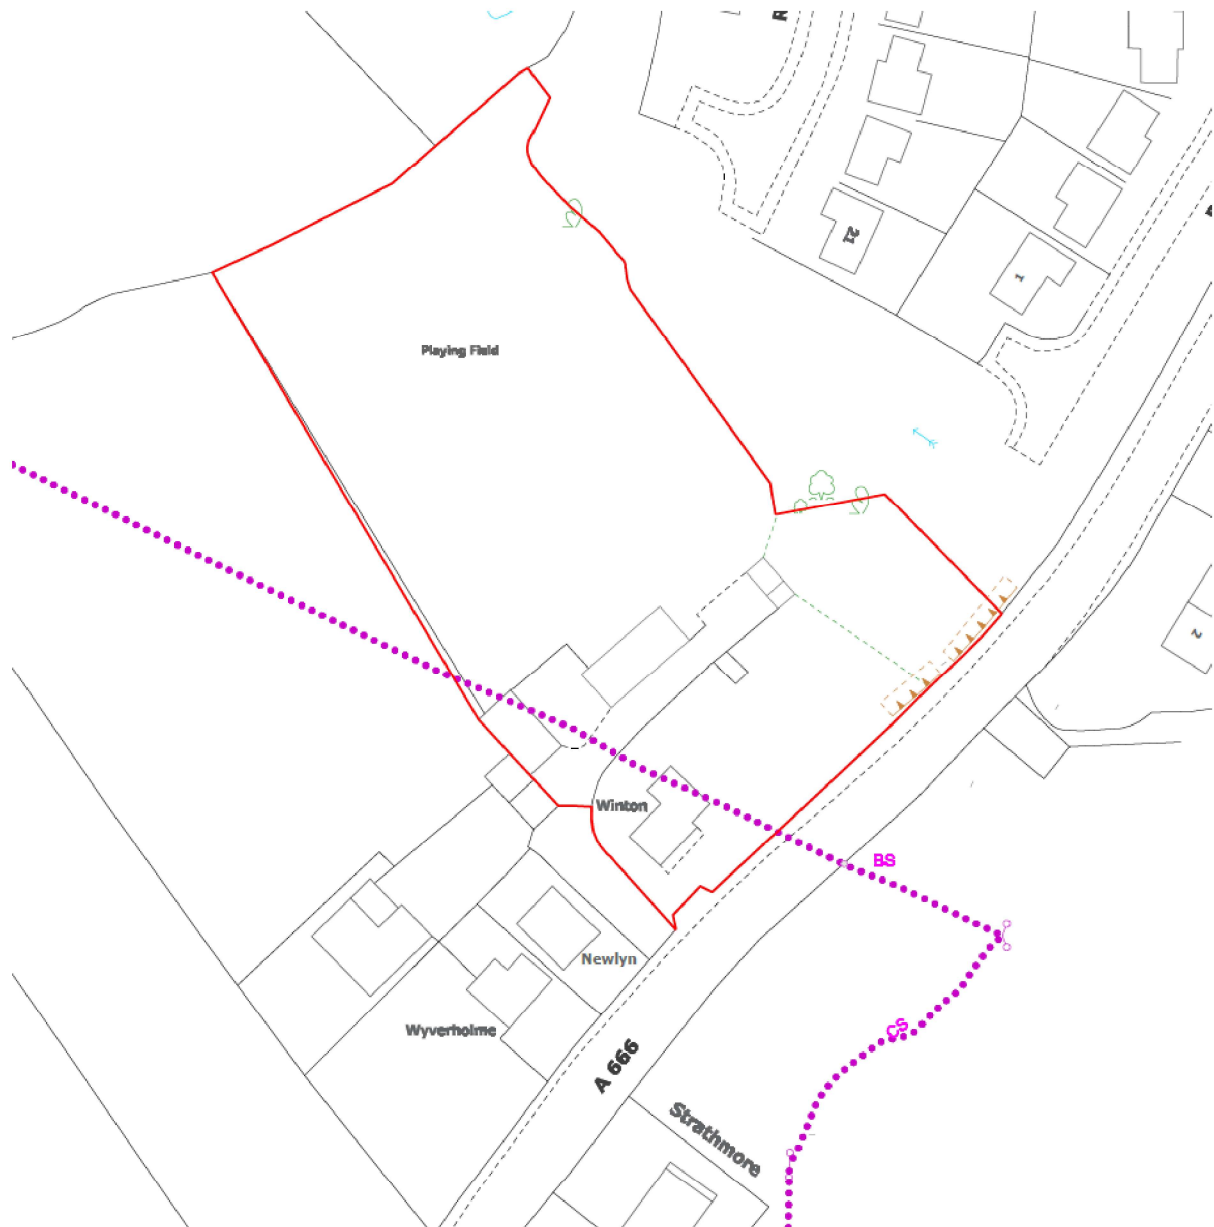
Existing Location Plan of Winton House and Ownership Boundary
